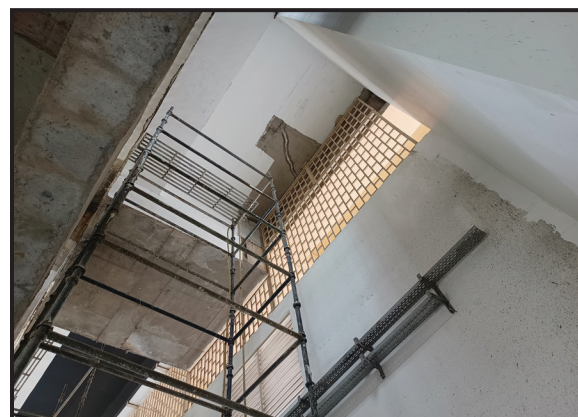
C - Cracks on plinth beam below rails at Nagasandra Station
